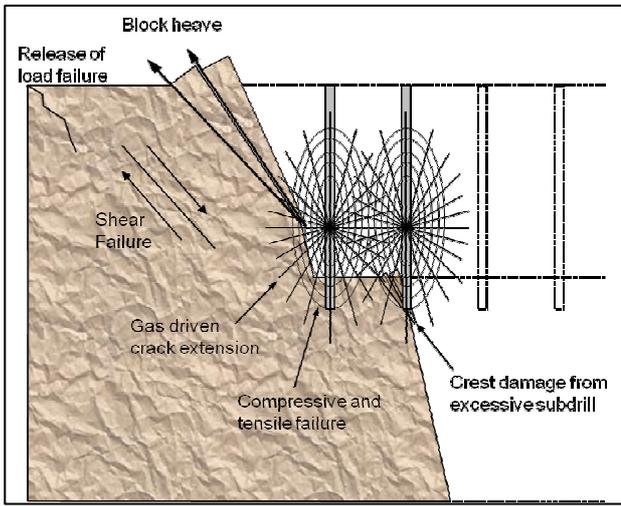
Blast induced wall damage mechanisms (ISEE 1998).
